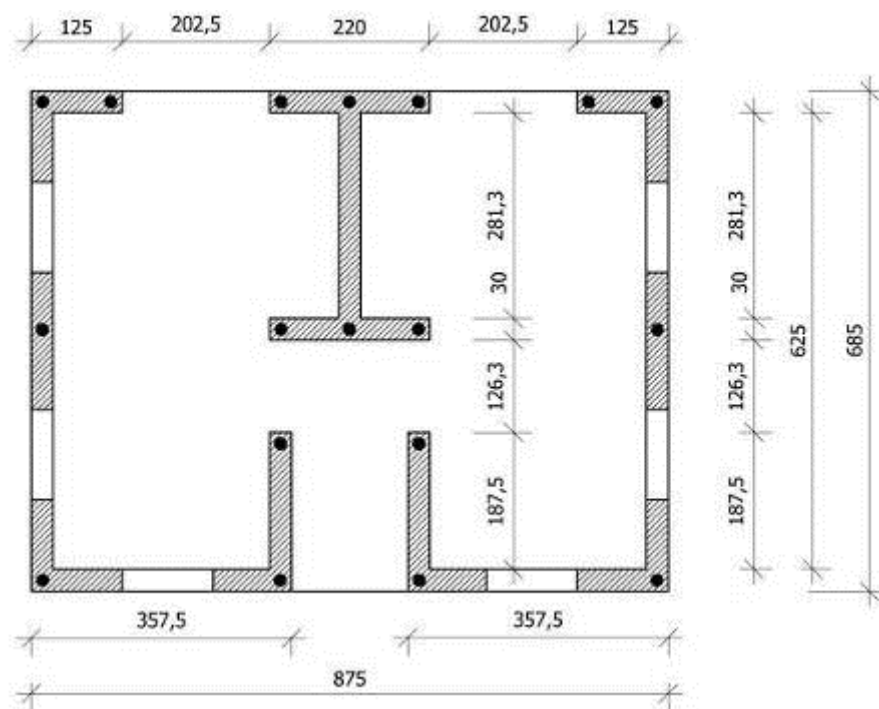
Dimensions of the idealised prototype building in plan and position of vertical confining elements [55].
